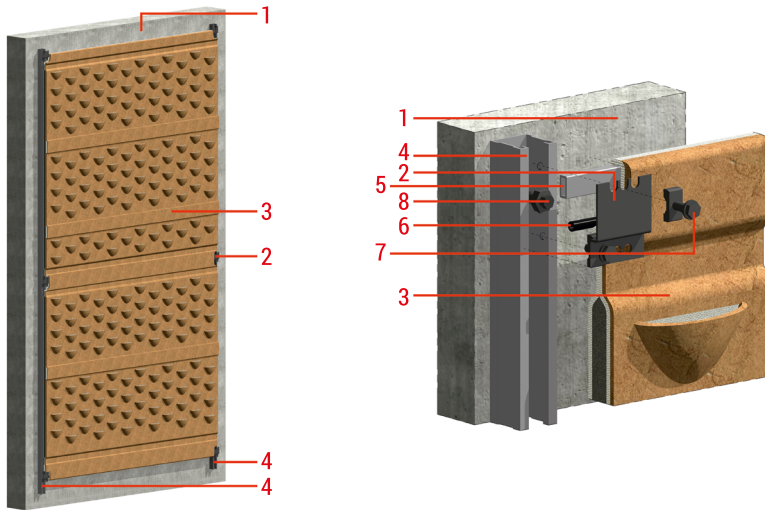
Axonometry and detail of the fastening node. Legend: 1. Load bearing layer; 2. Stainless steel fixing plate; 3. Panel; 4. Mullion; 5. Stainless steel fixing bar, box profile 20 x 9.5 mm (2 mm thick); 6. Driplines (irrigation system); 7. Hammer-head screw for fixing the plate to the mullion; 8. Mullion fixing dowel (Source: own elaboration)
